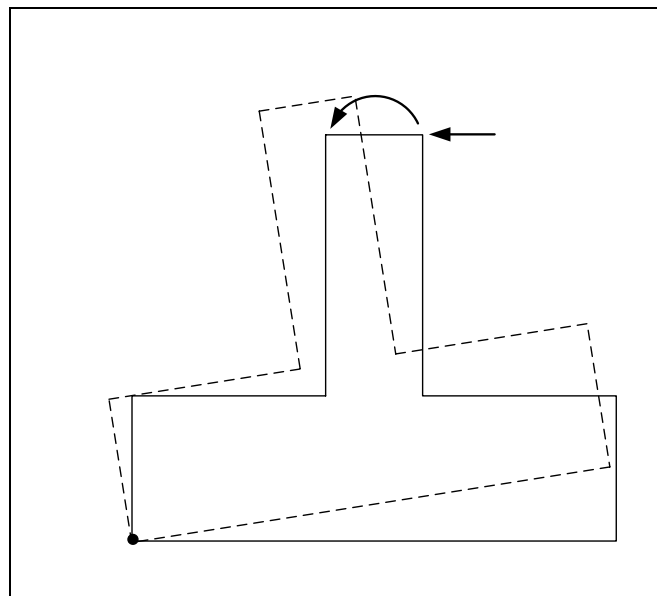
Inefficient overturning stability of the foundation causing failure.
